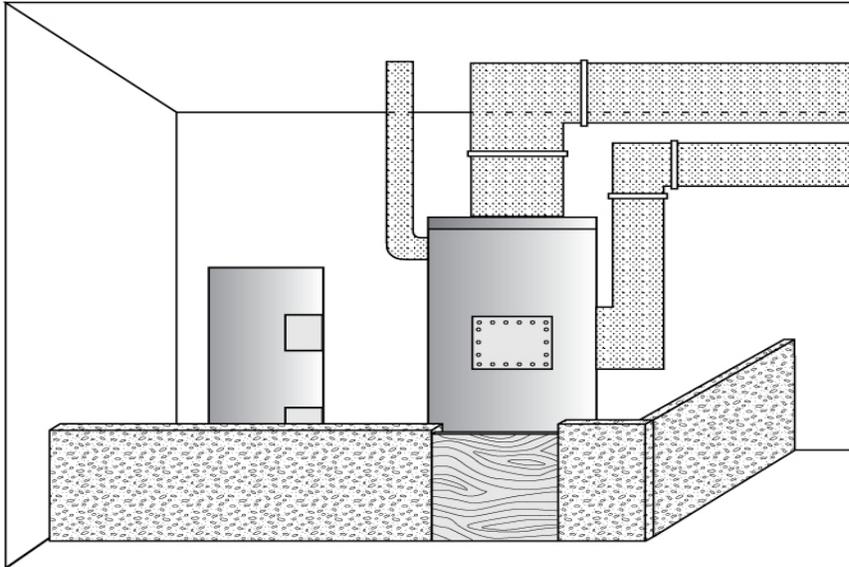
Small floodwall constructed to protect a furnace and hot water heater. A gate is installed for access.
